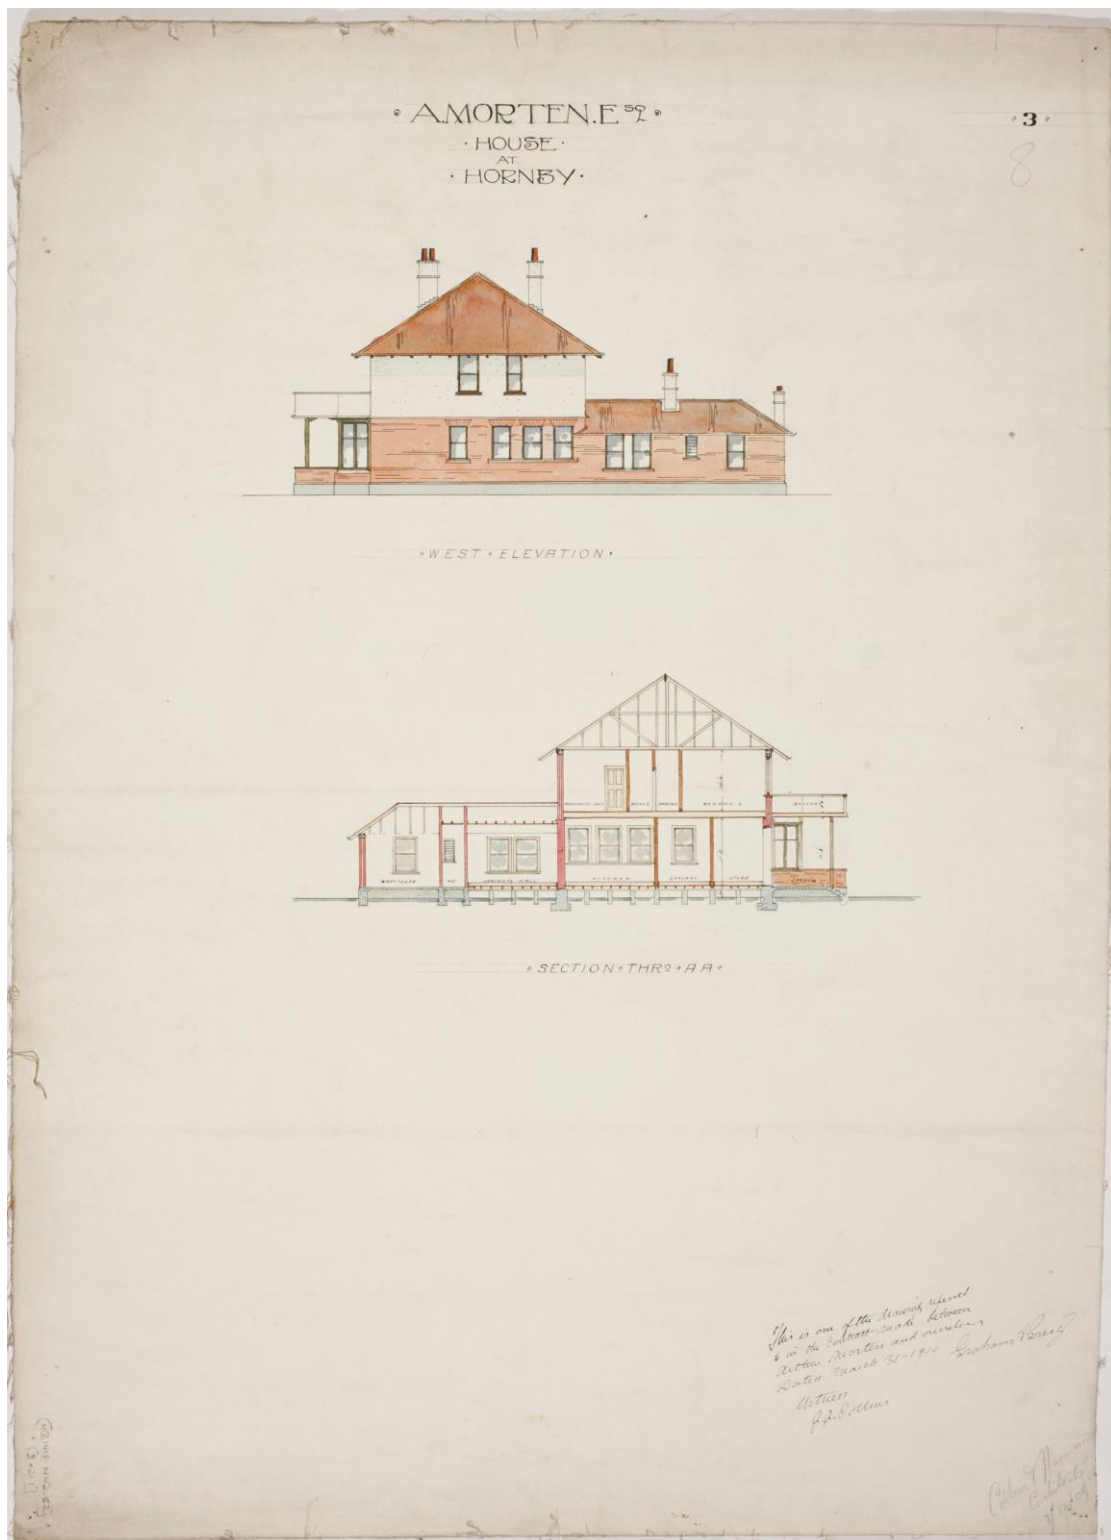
Collins and Harman, A. Morten, Esq., House at Hornby, west elevation and section (1910).
